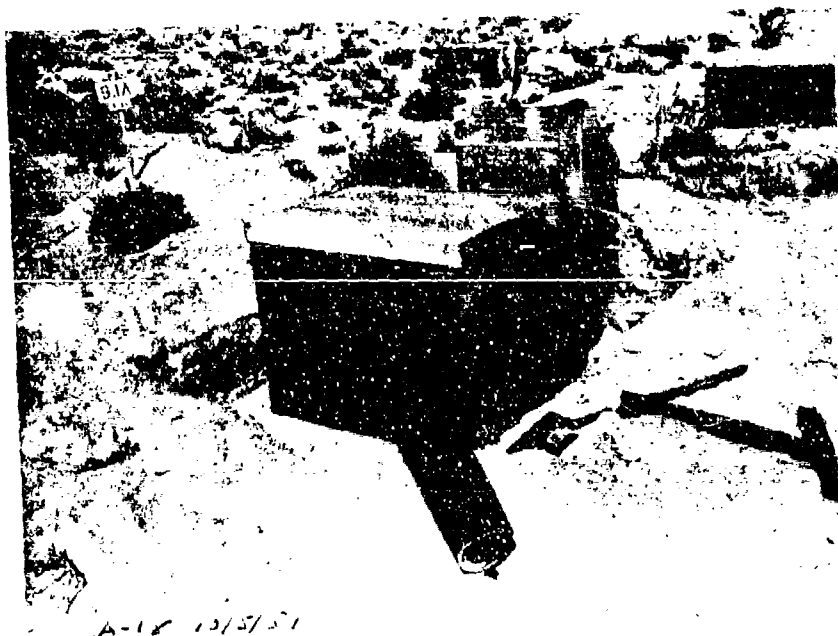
Shelter Structure A-18 in Position Before Backfilling (partly above grade)
